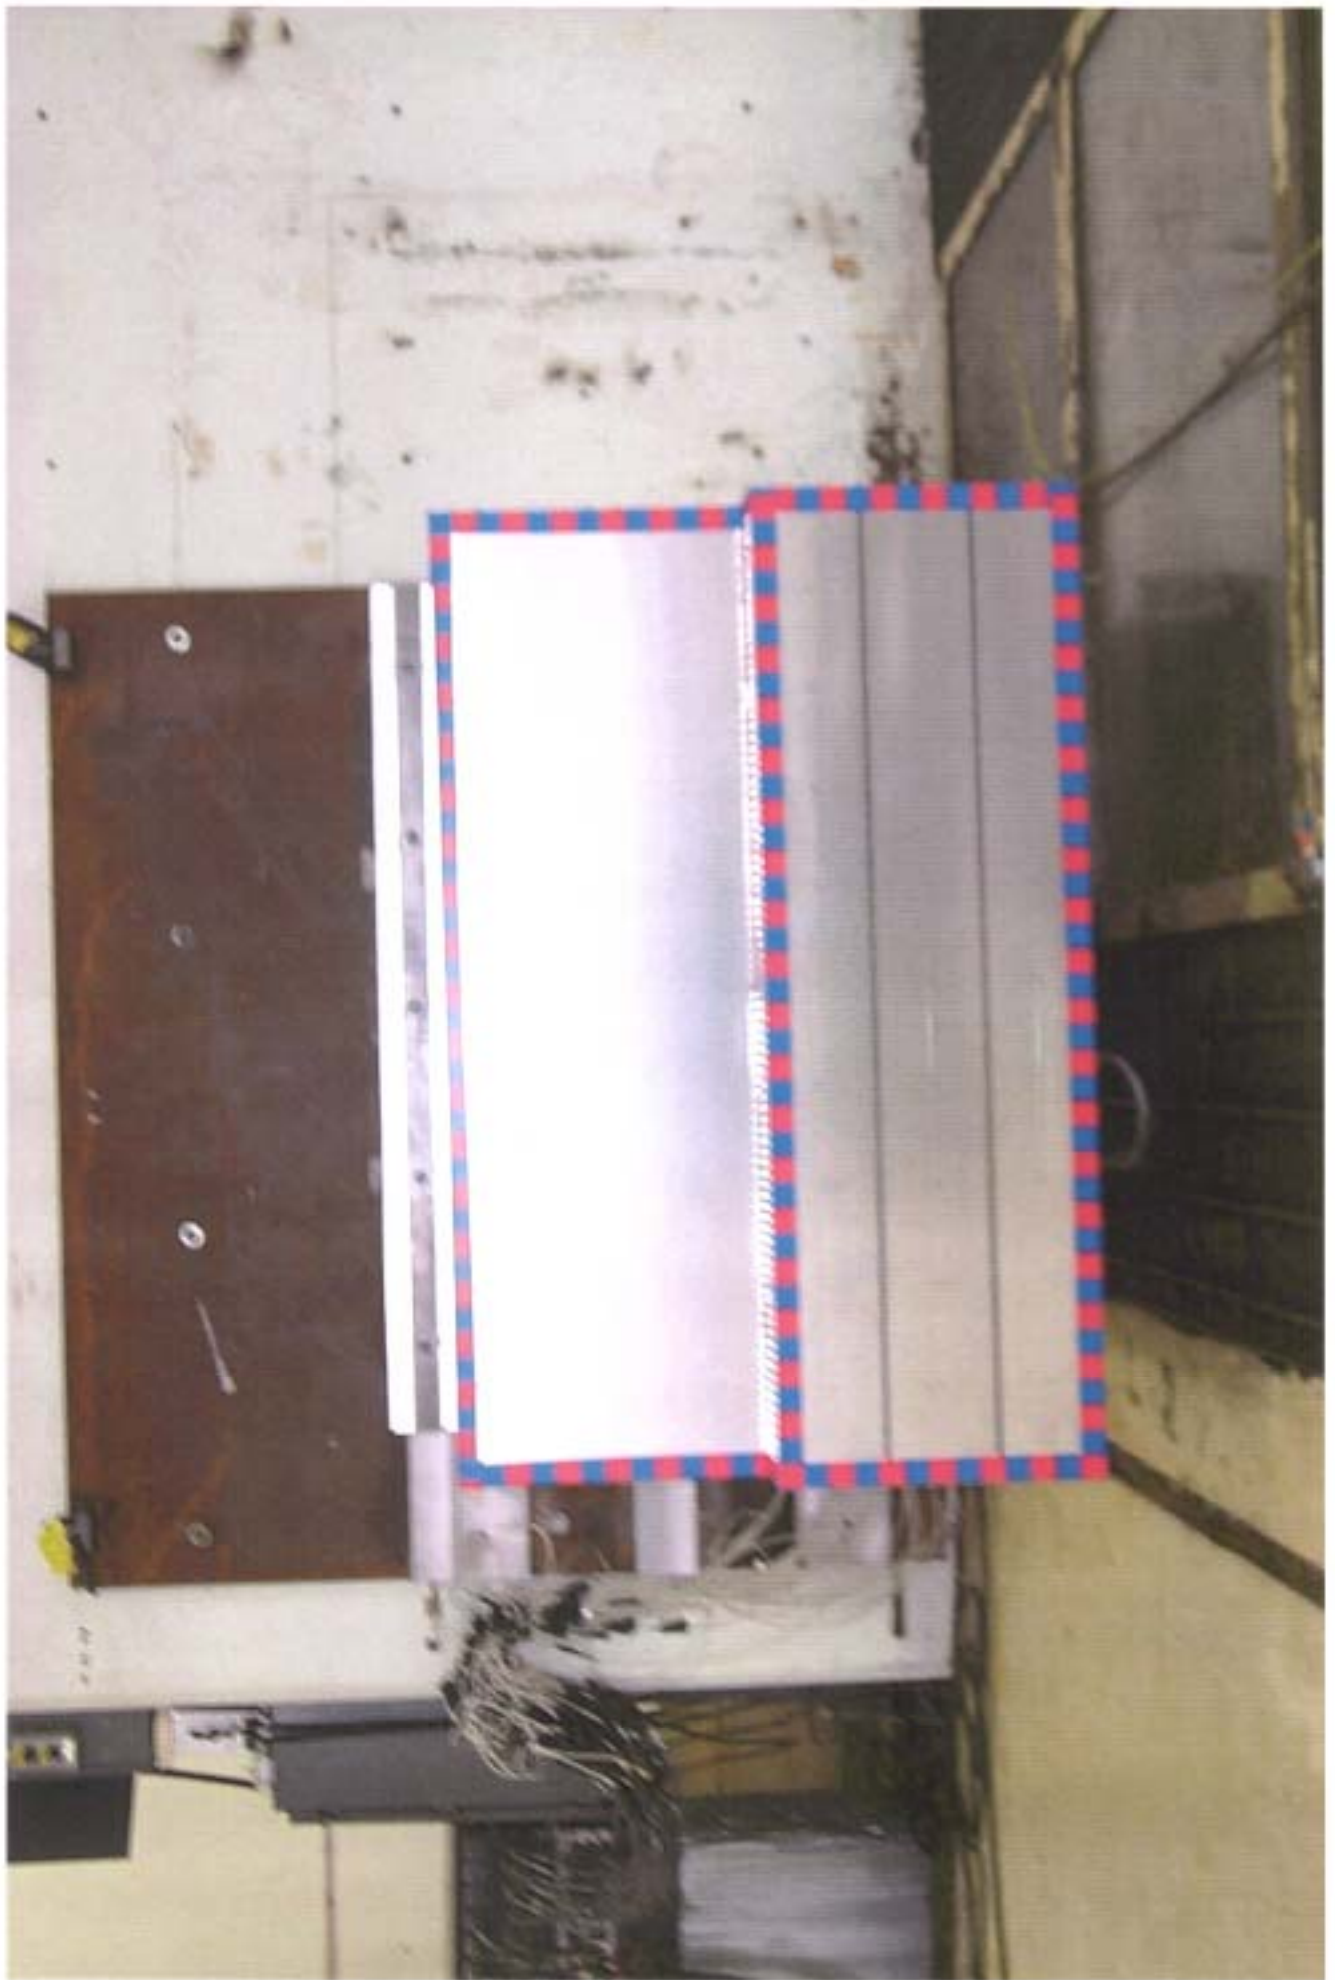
PRE-TEST BARRIER FRONT VIEW
